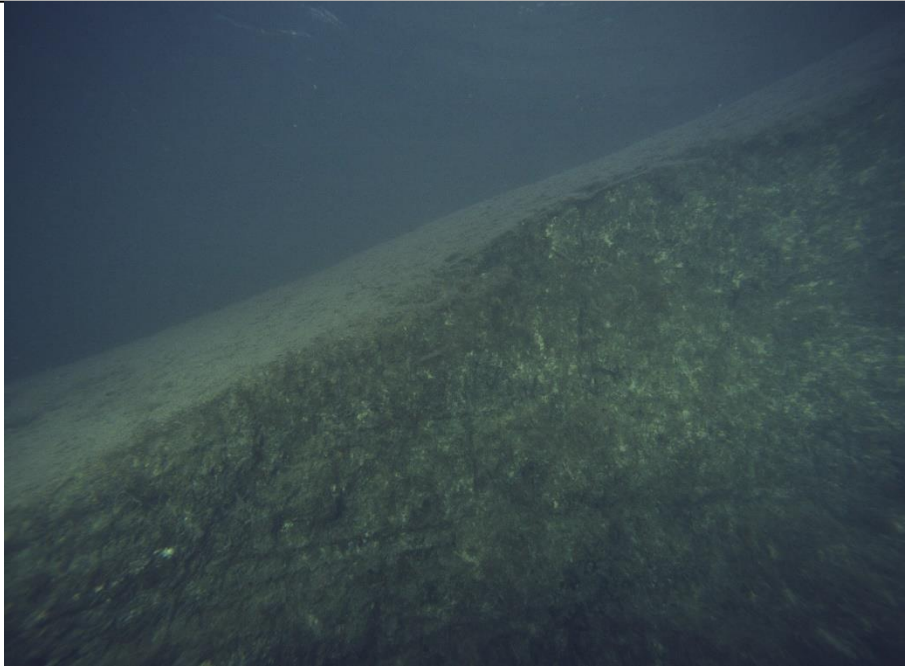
Eastern end of inlet concrete headwall. The headwall appears intact with no signs of major spalling or concrete damage. The concrete is covered in thick fouling.
